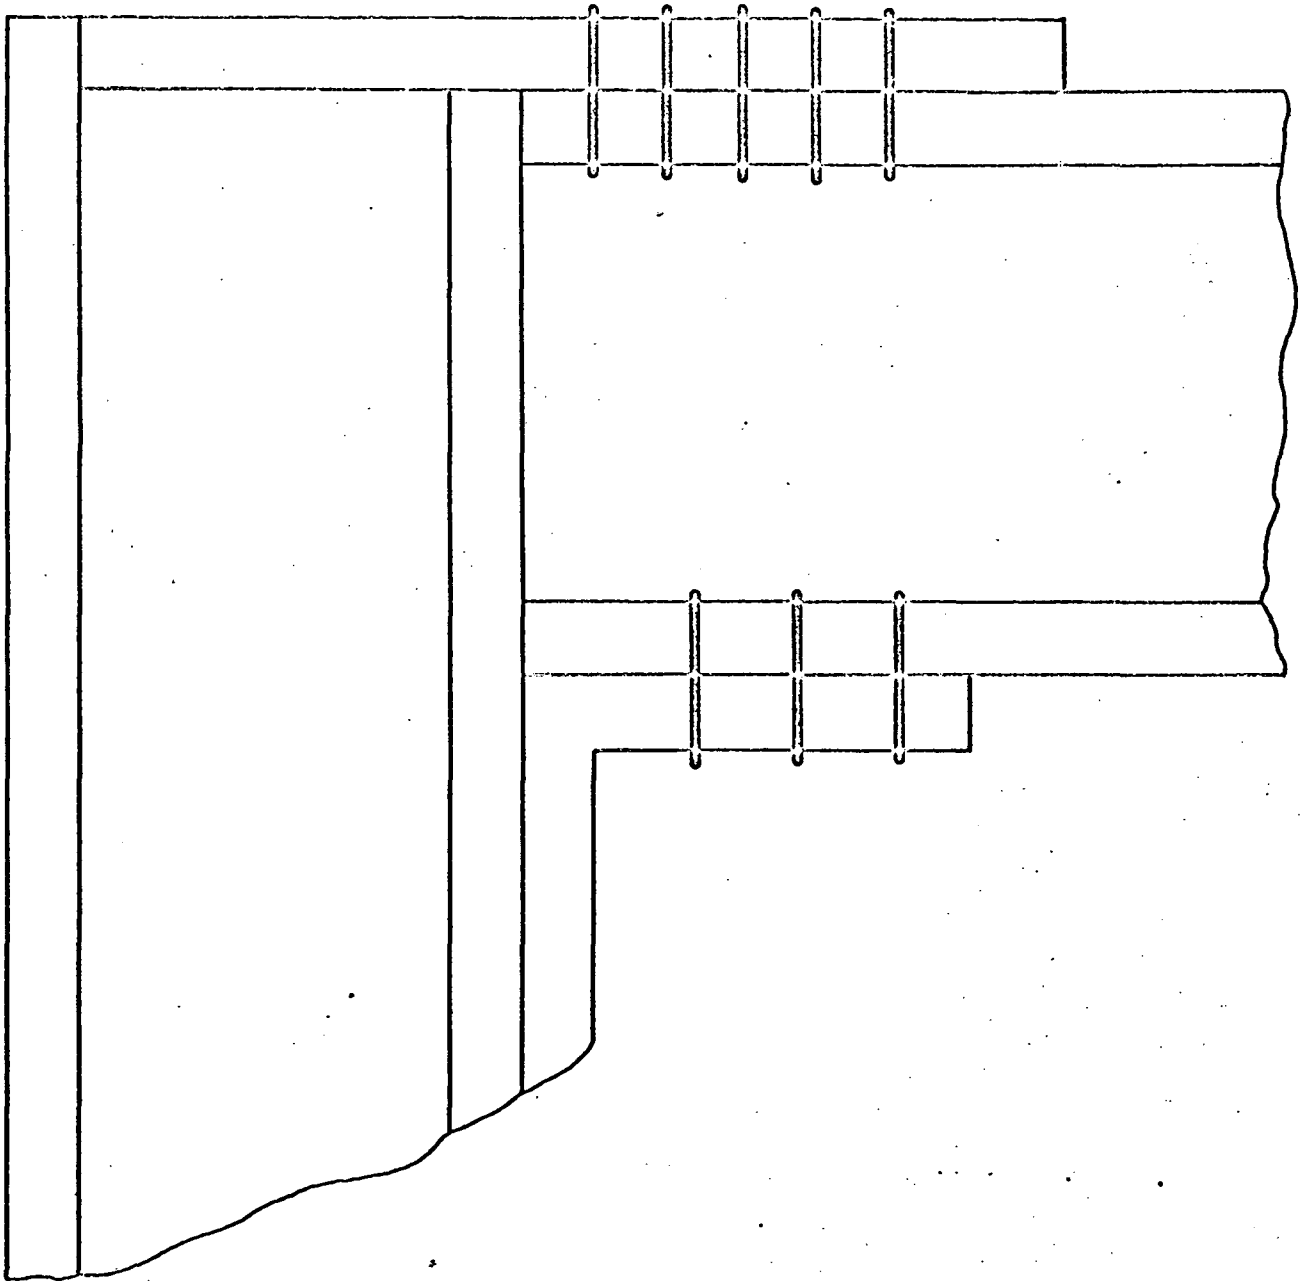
RIGID FRAME CORNER CONNECTION
